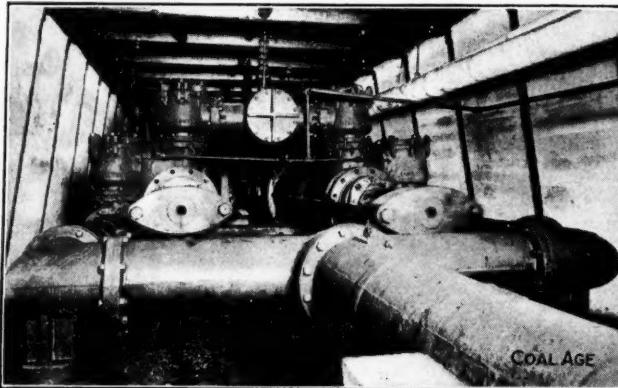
VIEW OF PUMP ROOM, PUMP AND CONDENSER
